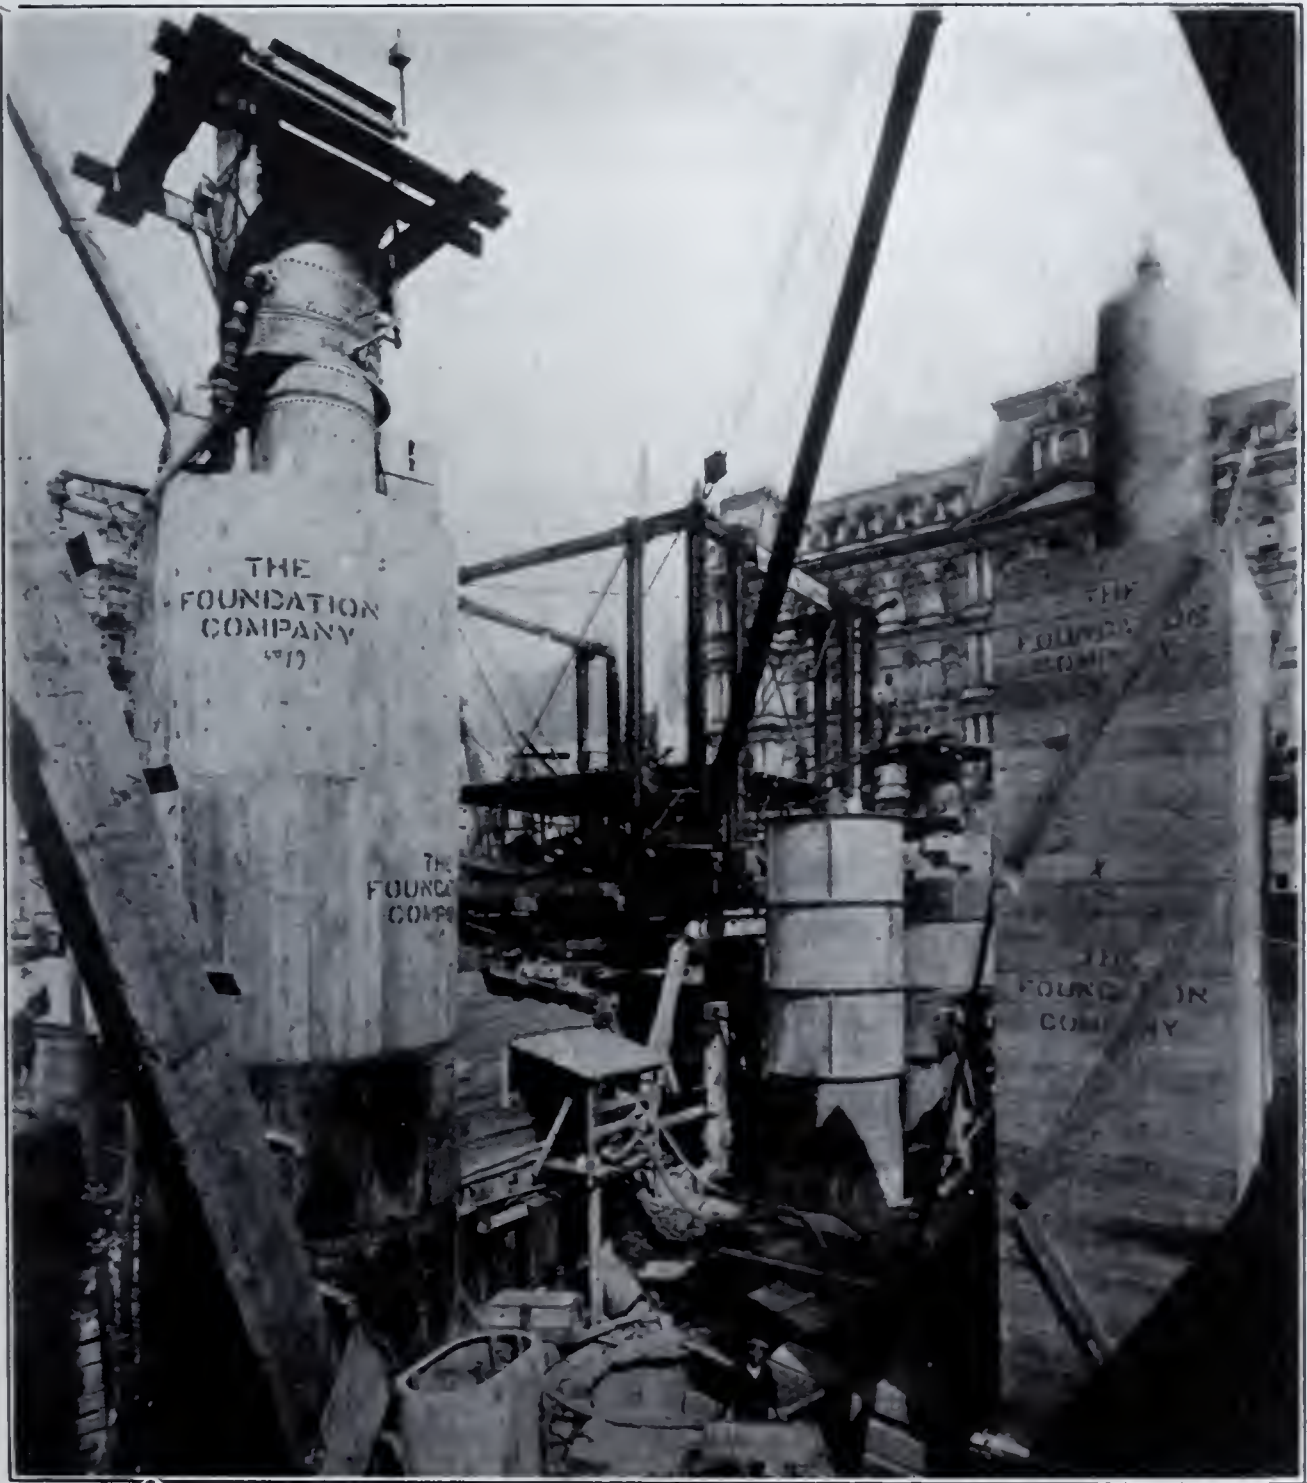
Pneumatic Caissons in Foundation of Woolworth Building.
